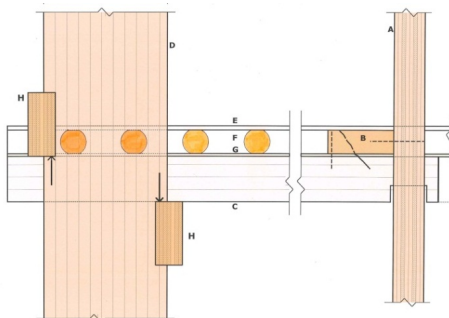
Floor Beam Elevation, A – IPC (integrated panel core), B - 'hoop' beam (Screw fixings to IPC and floor beams are indicated), C – engineered timber floor beam (loose notch indicated at IPC to allow rotation), D – engineered timber column, E – flooring, F – floor joists, G – ceiling, H – corbels to transmit beam moments to the column.
